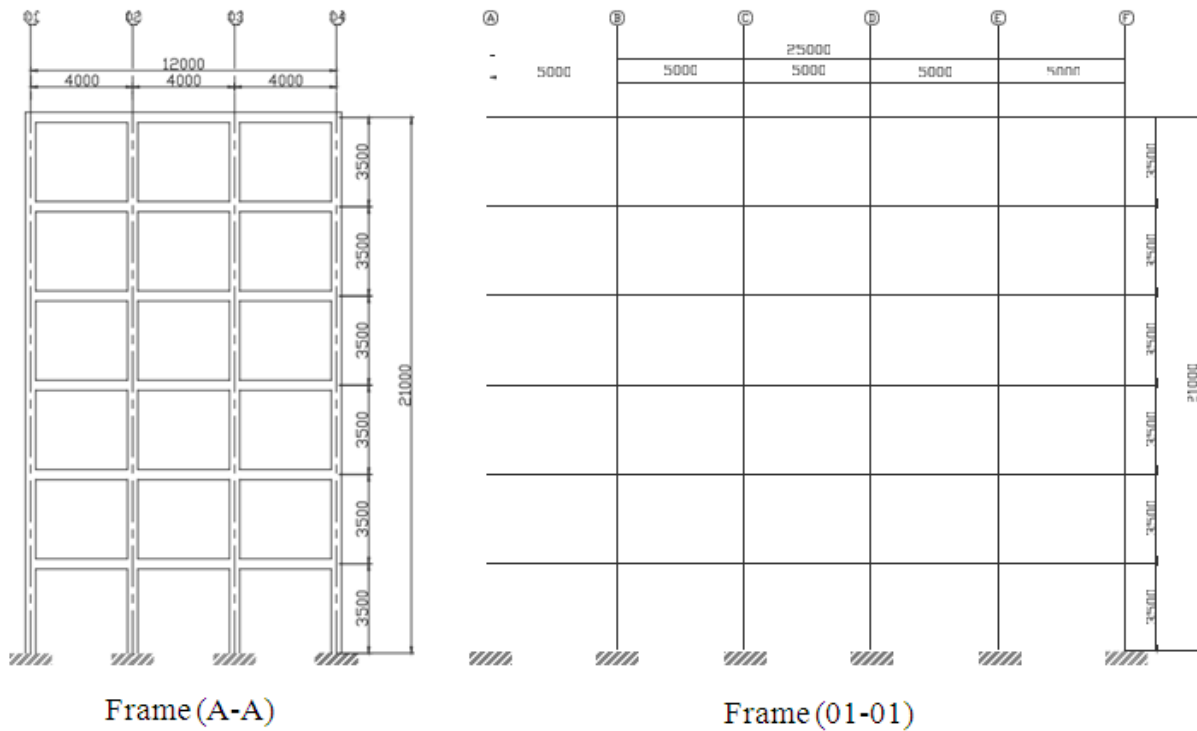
Frame (A-A) and (01-01) of six-story regular RC building (all dimension are in mm)
